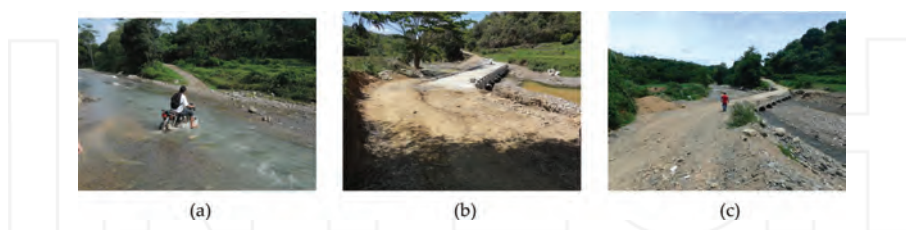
Conditions at the intersection with the river before and after construction: (a) Before the construction; (b) after the construction; (c) the conditions one year after the construction.
